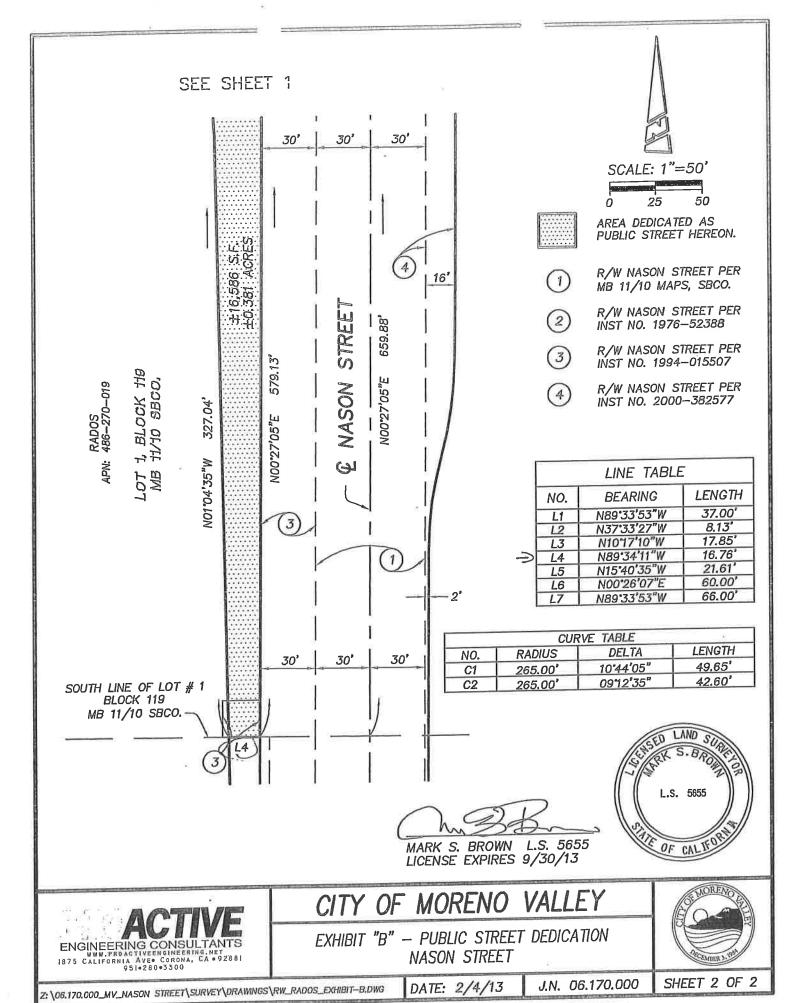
EXHIBIT "B" — PUBLIC STREET DEDICATION NASON STREET
